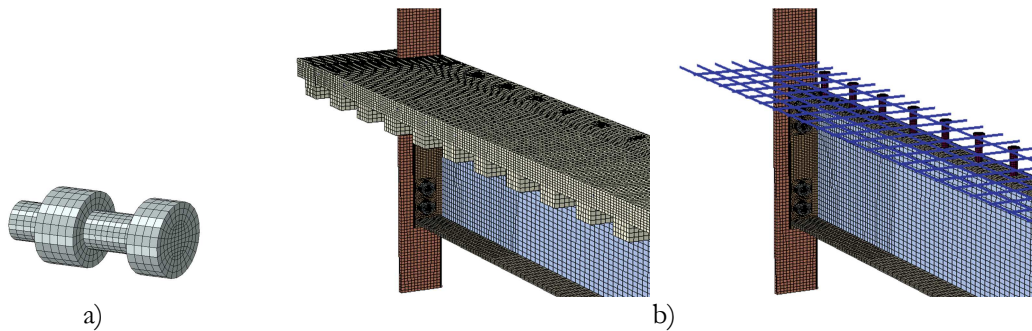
3D meshed FE model in Abaqus: a) bolt, and b) rebars and shear studs detail
